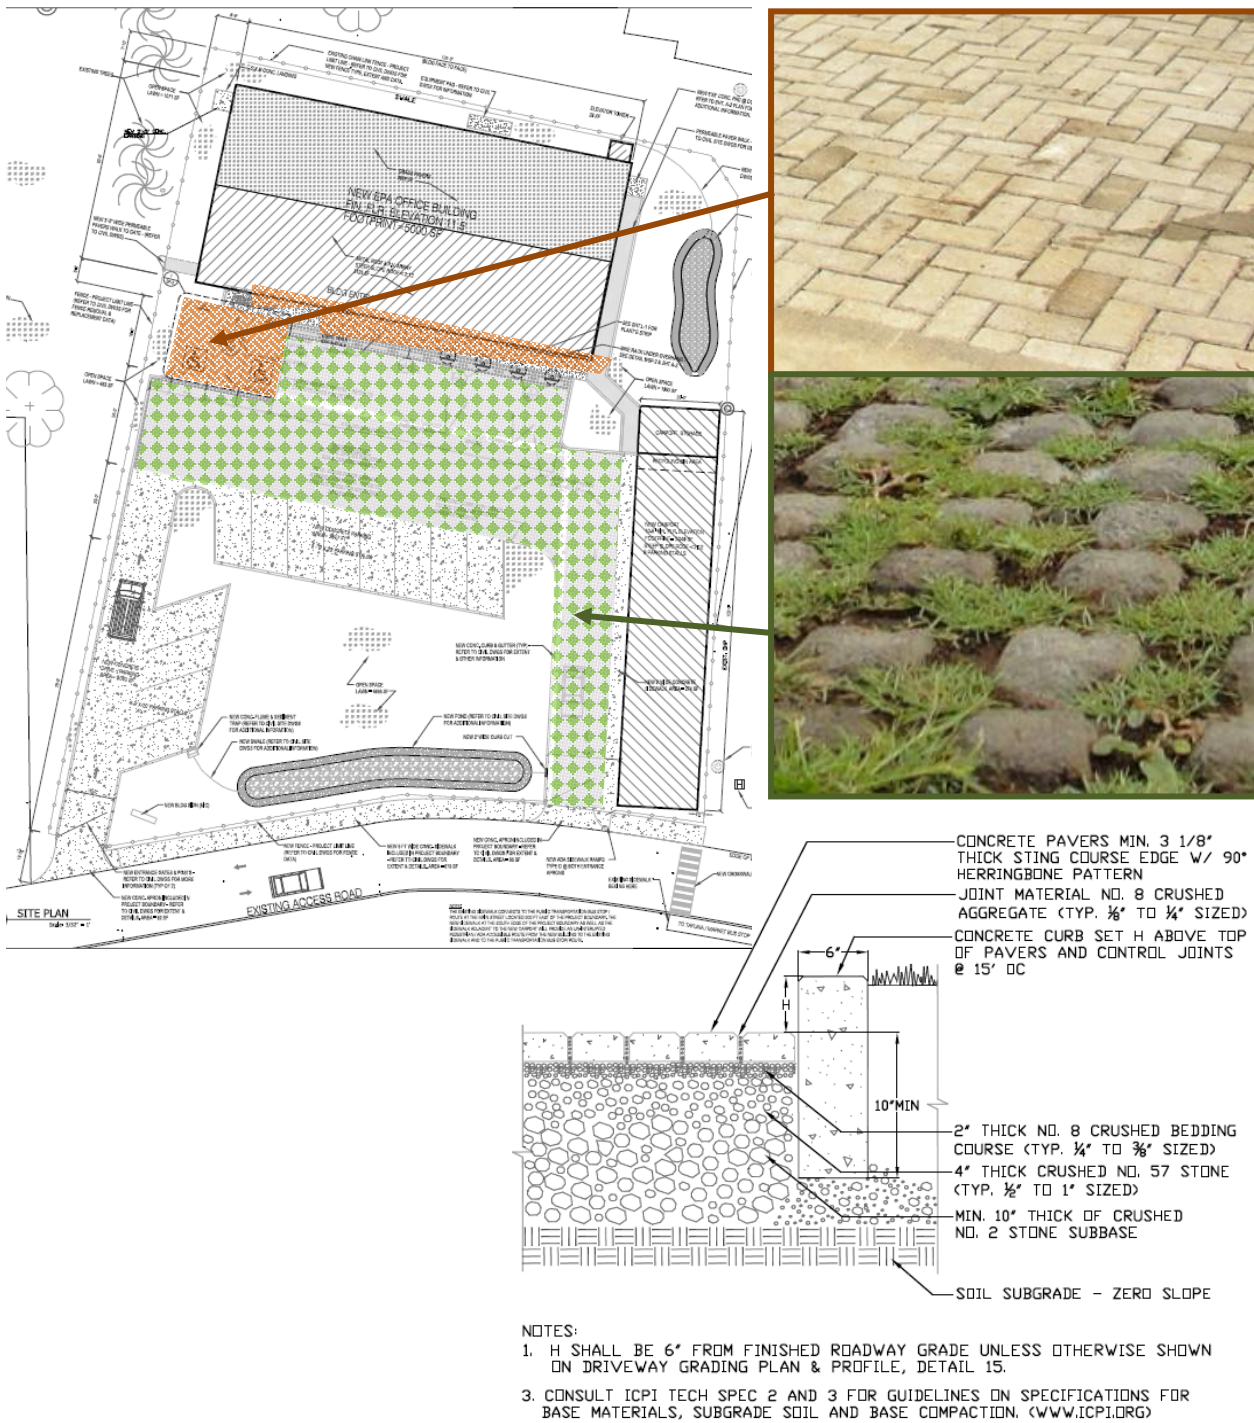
Excerpts from the American Samoa-EPA building construction plans show the locations of two types of permeable pavers and include a detail describing the type and depth of underlying aggregate.
